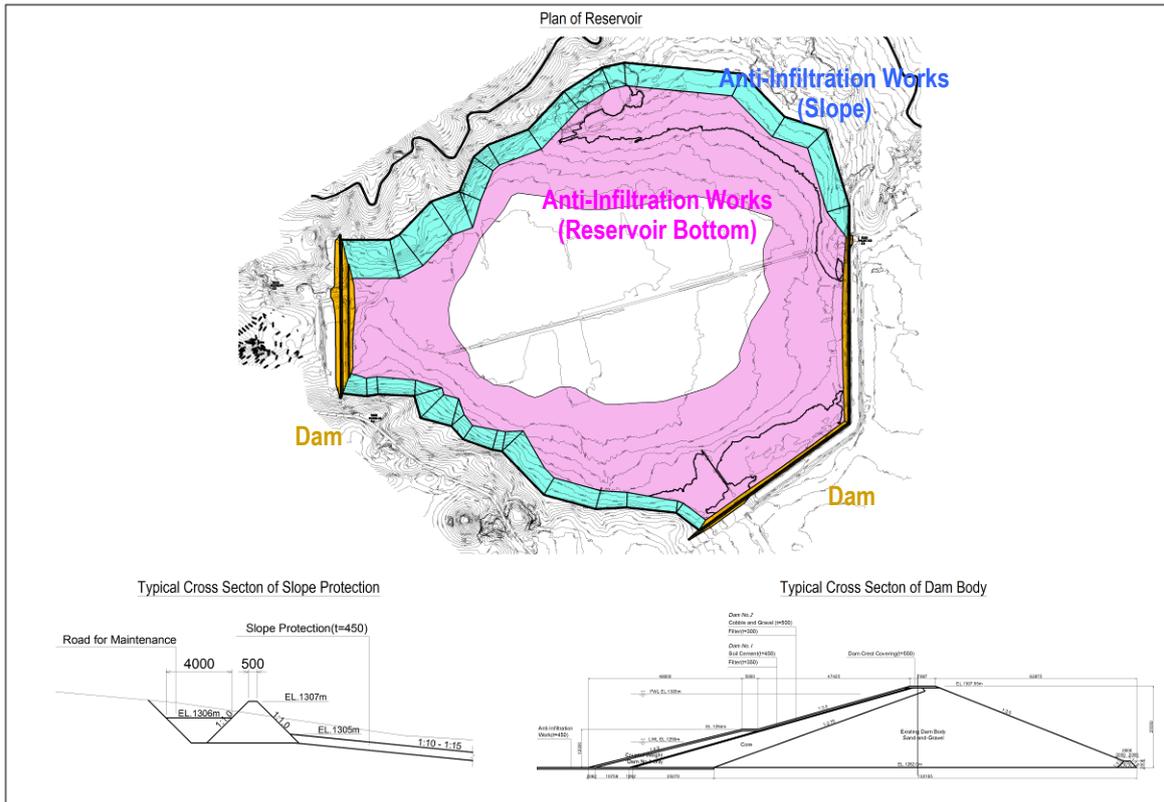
Plan and Typical Cross Section (Plan-A)
